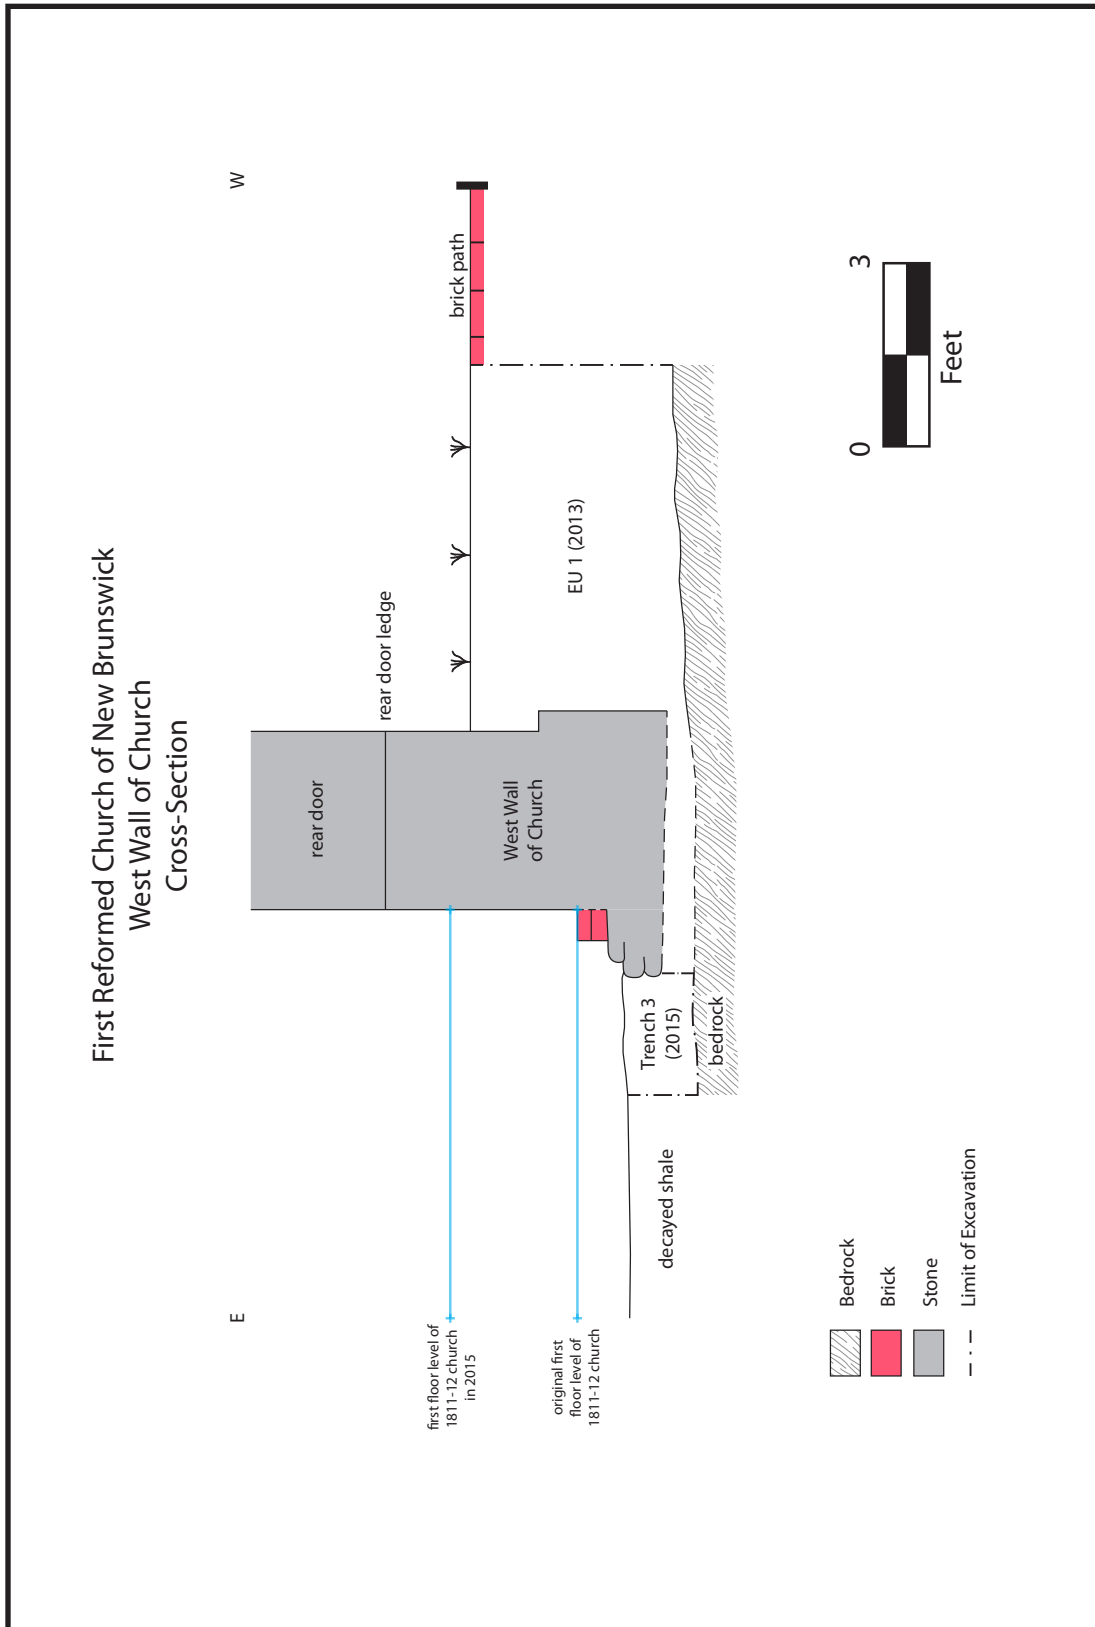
Cross-Section Through West Wall of Church Showing Interior and Exterior Elevations.
